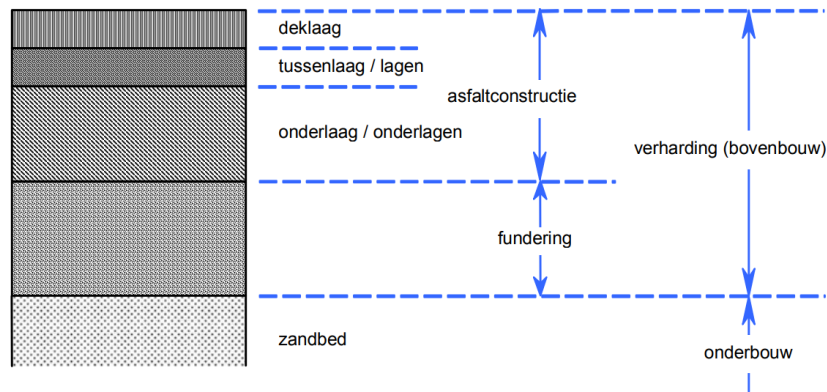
Structure of an asphalt surface road consisting of surface, bin/base and a foundation layer (Rijkswaterstaat; Dienst Grote Projecten en Onderhoud, 2016)⁹
